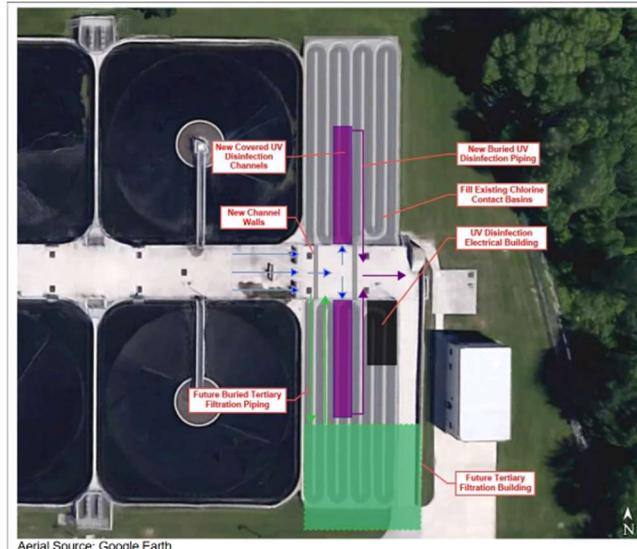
Alternative No. 1 UV Disinfection Site Plan
